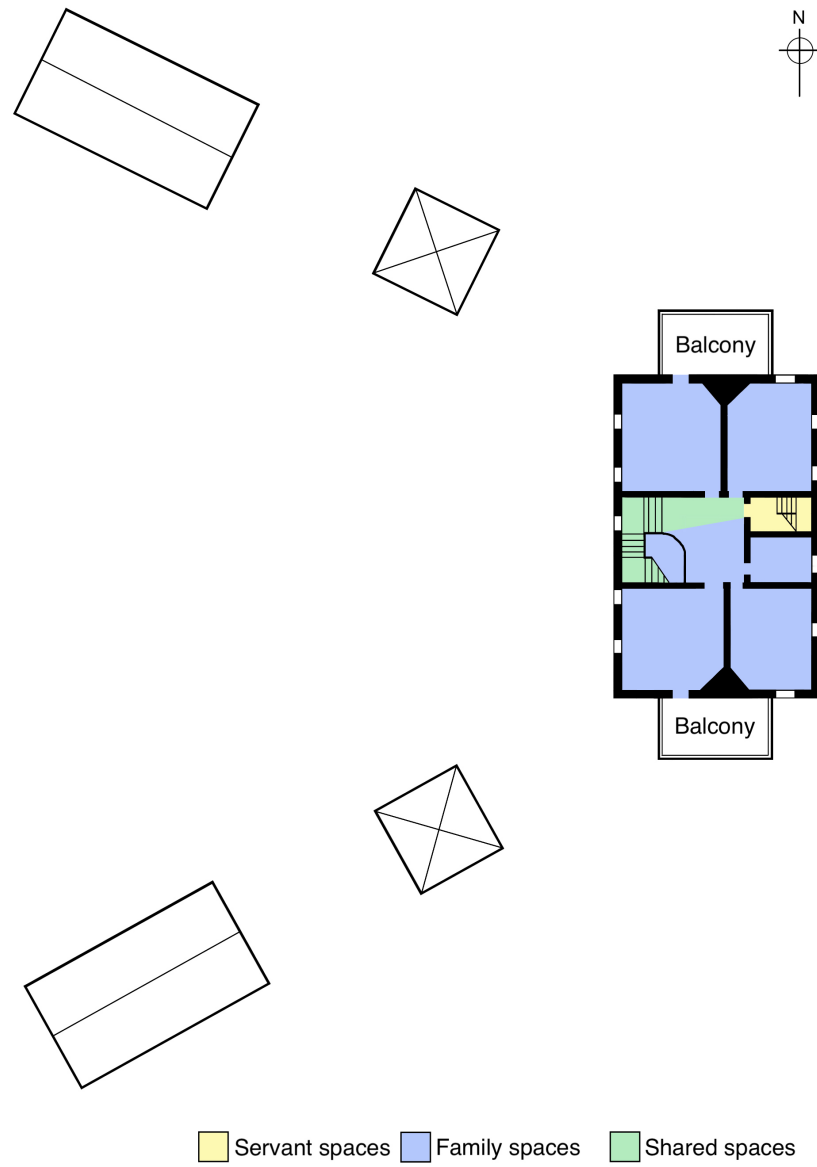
Mount Vernon c1759 Phase 1 first floor plan
